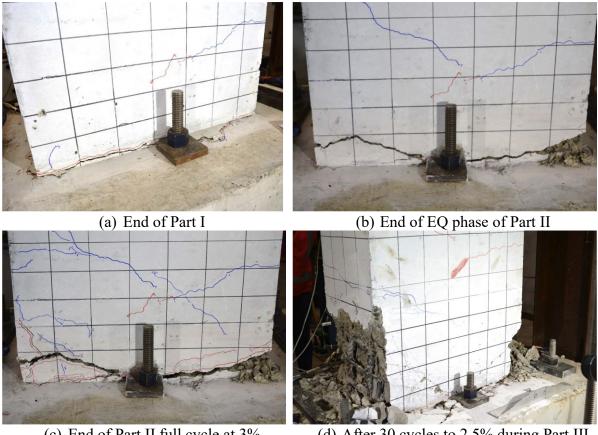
Pictures of Specimen EQ-S-1.96.25
